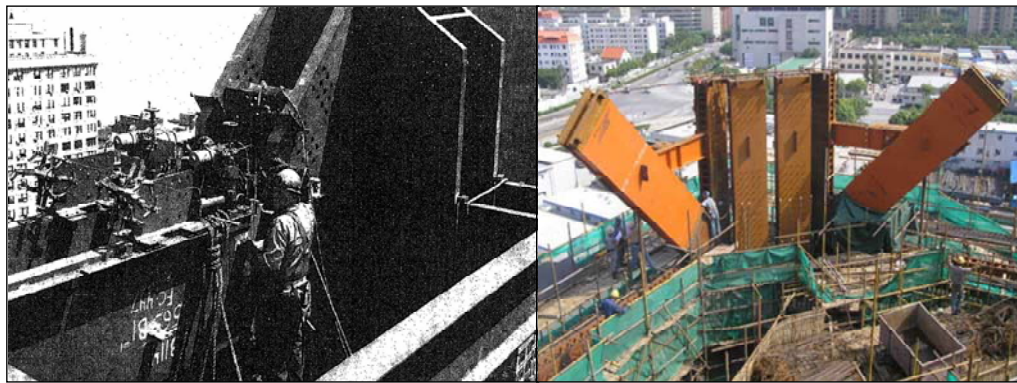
(a) Joints in the John Hancock Center (Khan, 2004, p. 19); (b) Joints in Shanghai World Financial Center (Katz, Robertson, & See, 2008, p. 72)
